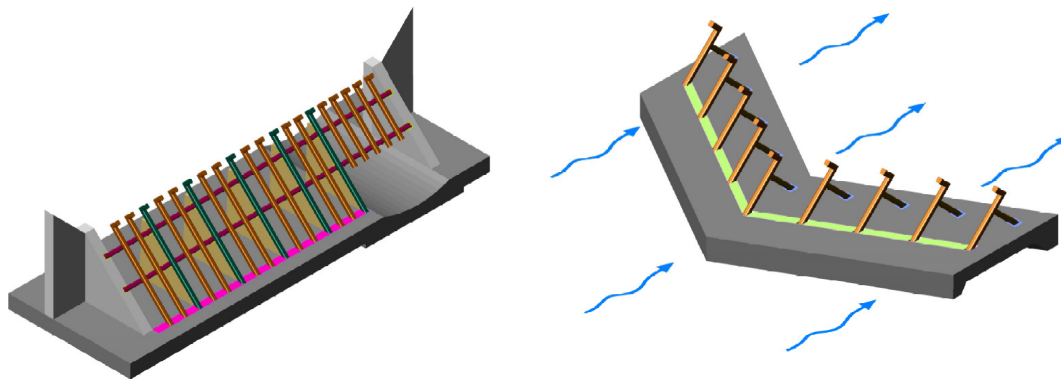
Three dimensional view of the two wood retention structures: left, the inclined-grid (45°) check-dam to be installed upstream; right, the V-shaped inclined (45°) racks to be constructed downstream.
